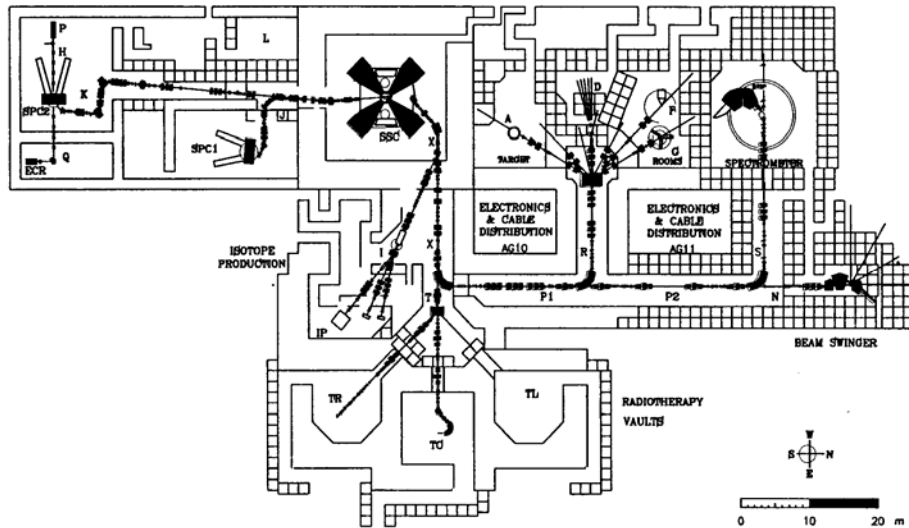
An overview floor – plan of the facilities at iThemba LABS.
